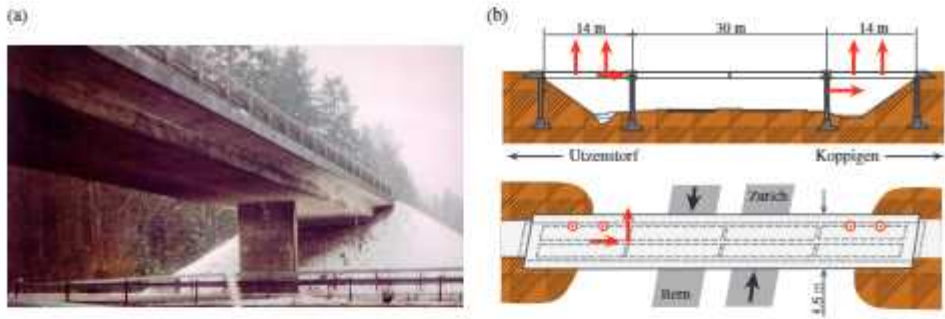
General view of the Z-24 Bridge (a) and sensors layout (b).
